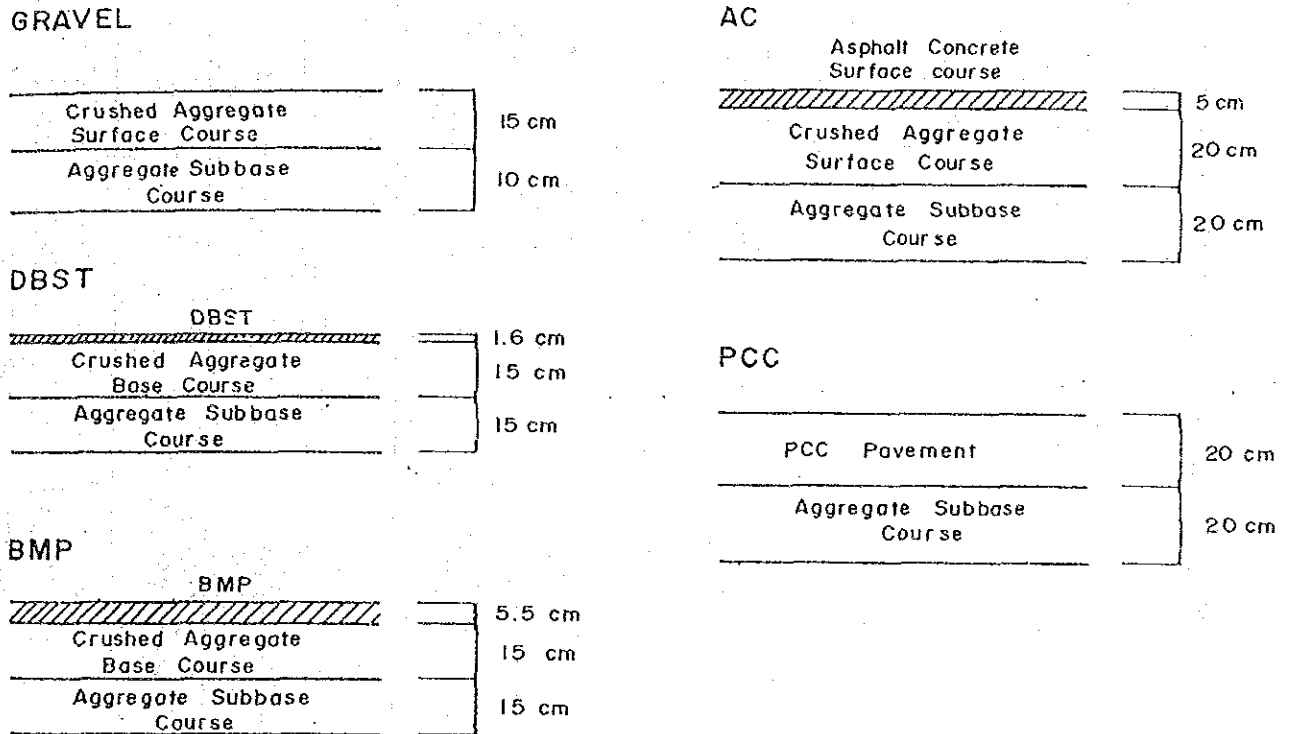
STANDARD PAVEMENT STRUCTURE
